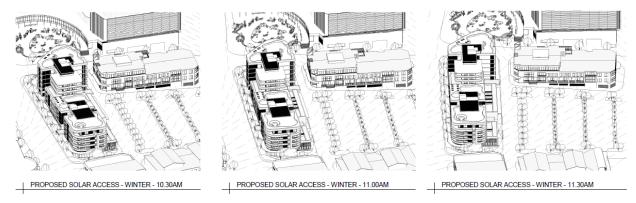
Extract from Sun Views Plans mid-winter 10.30am to 11.30am (Source: DWA Architects)
